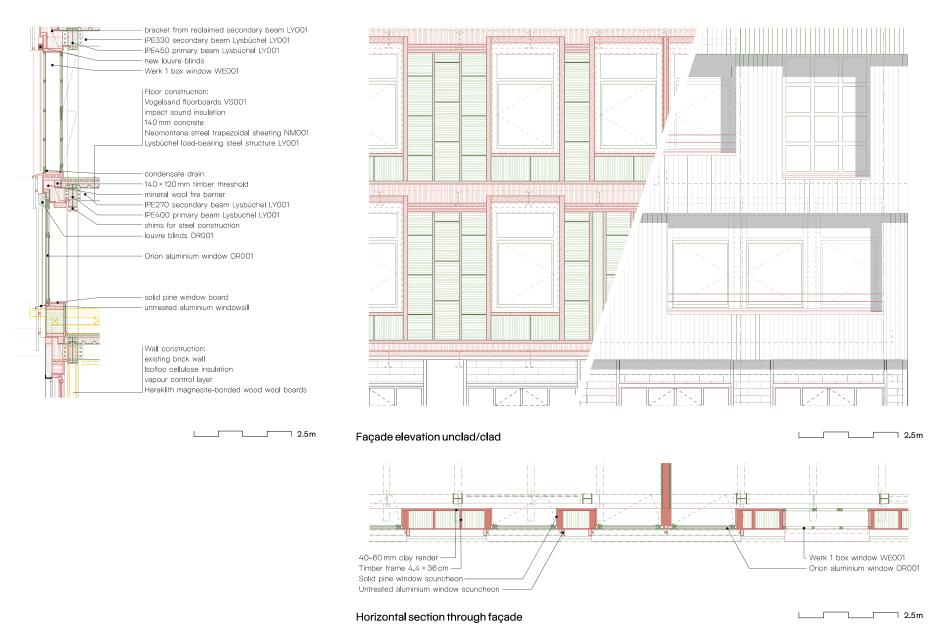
Detail section and floor plan with view of the K118 Façade @Baubüro in situ
